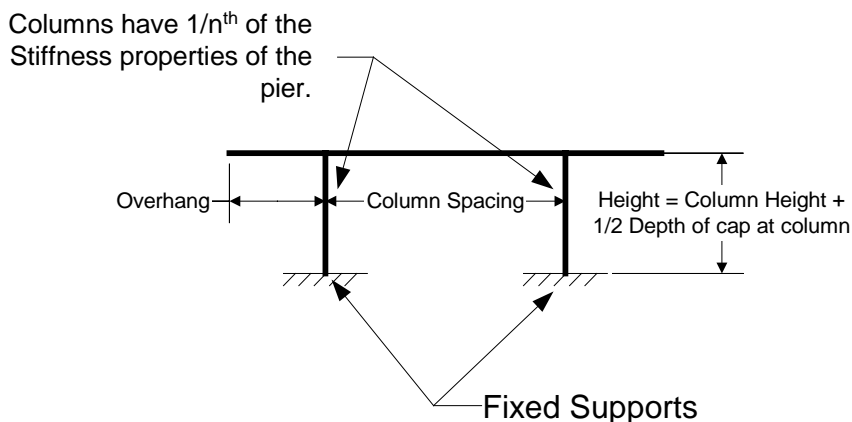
Analysis Modeling of Fixed Height 3D Piers
